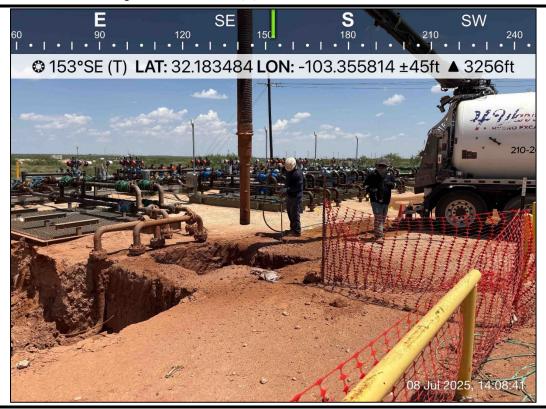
Southeast view during excavation activities. 7/8/2025
